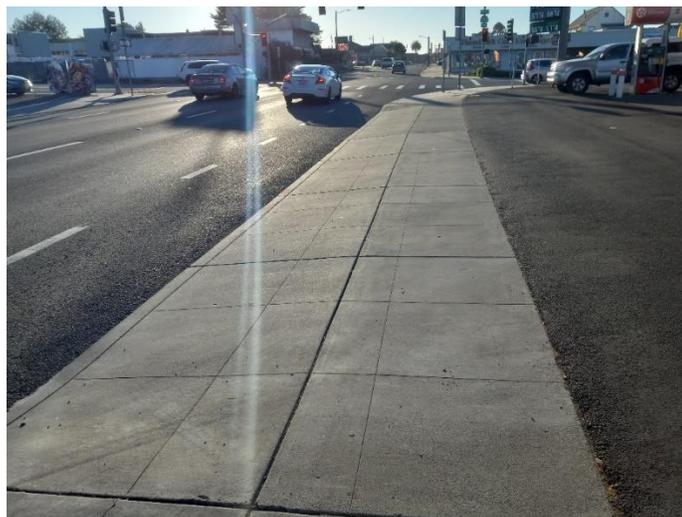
A very long driveway/curb cut at a gas station at 4th Street and R Street/SR-255.
